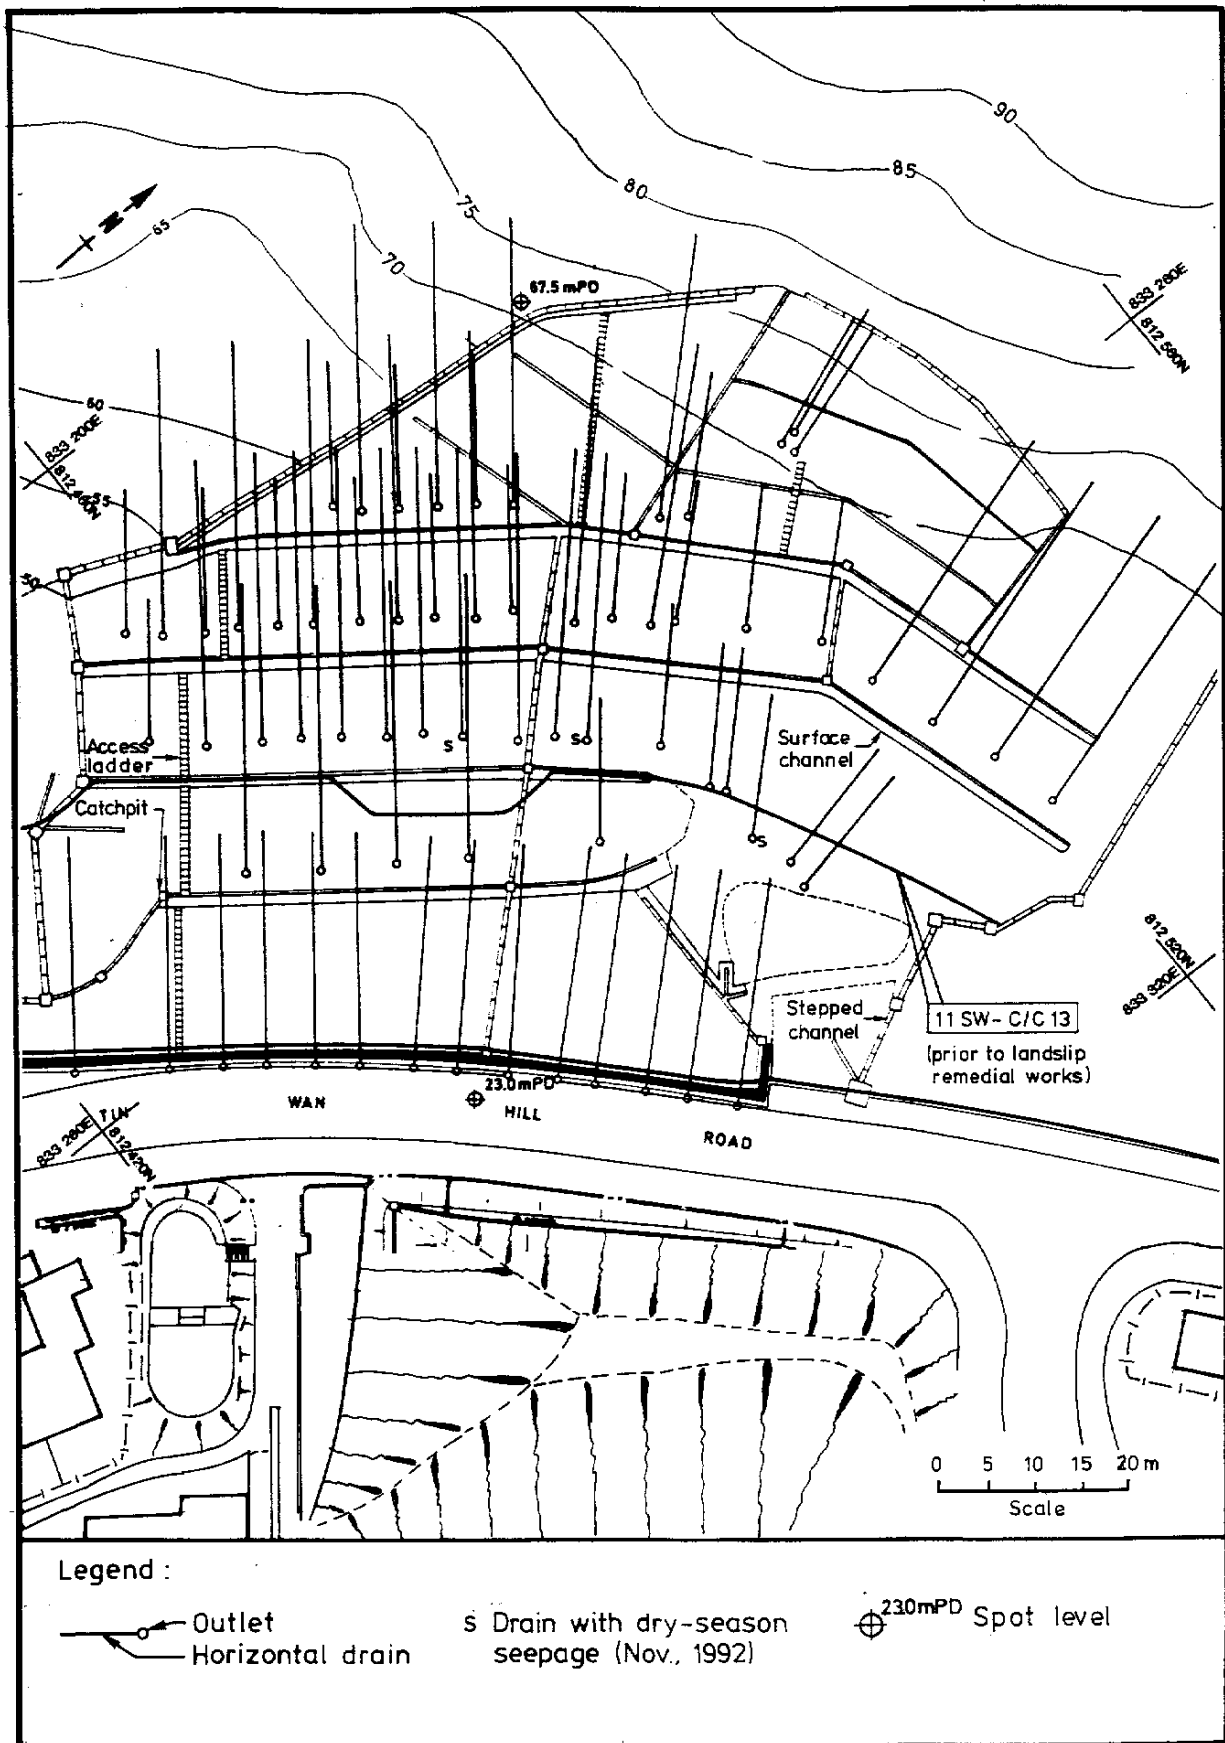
Layout of Horizontal Drains at Tin Wan Hill Road
